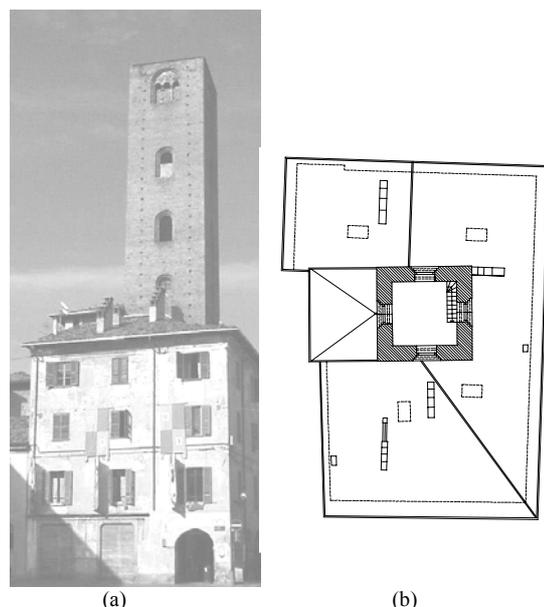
Elevation view of the tower (a). Plan of the tower and of the surrounding building (b).
